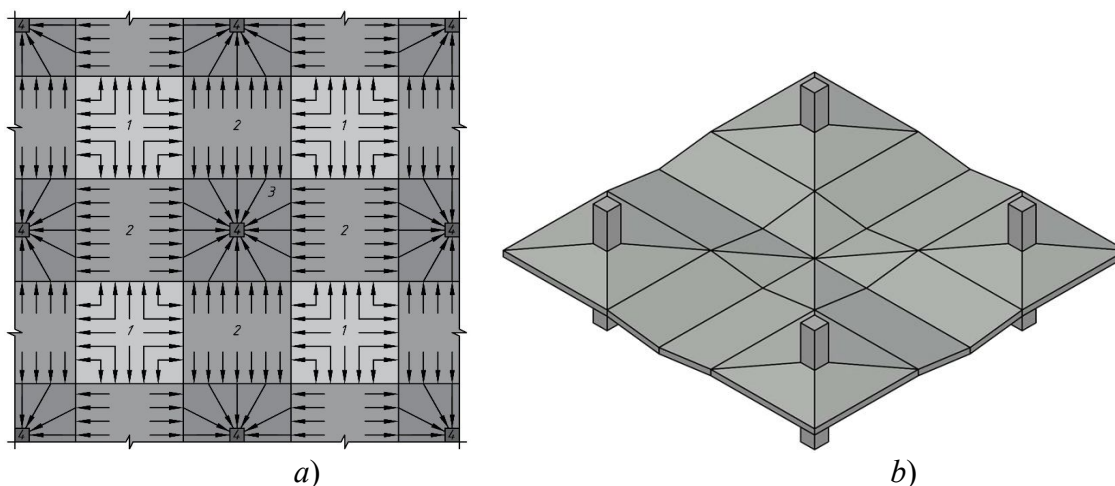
Directions of load transfer between the members of the flat plate floor system (a) and model of failure of precast flat plate floor system members (b):
